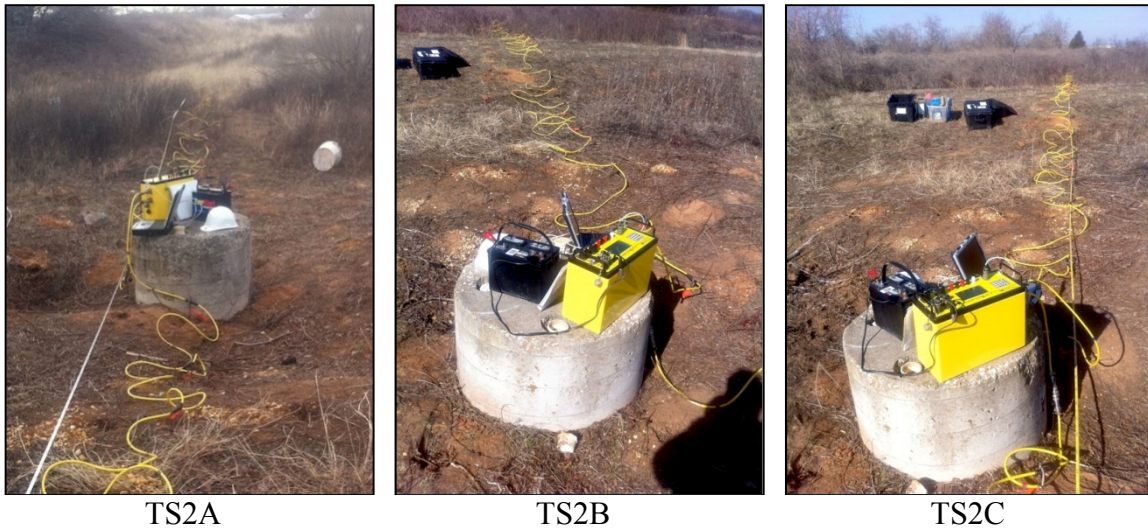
3D ERI Layout at Footing SF-5.
